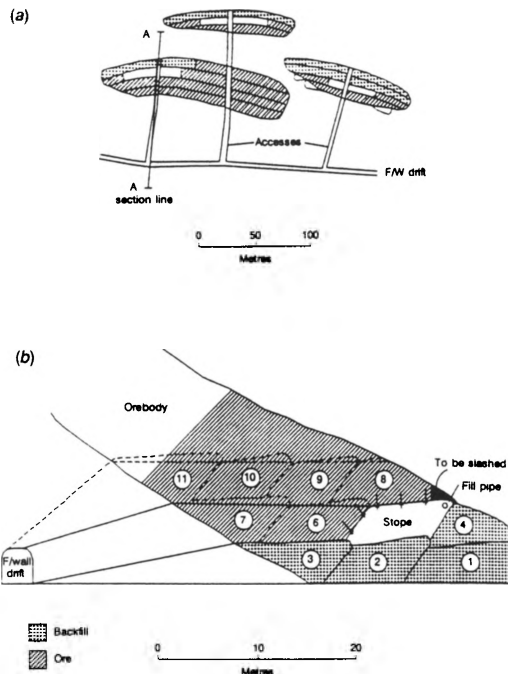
(a) Typical drift-and-fill layout plan, and (b) vertical section showing mining and filling sequence, Neves Corvo mine, Portugal (Bailey & Hodson 1991).
